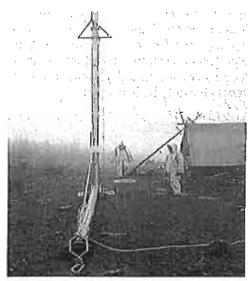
Met Tower Installation at Hushamu (on unused road), Fall 2003.
